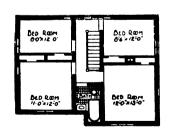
HOUSES SOLD UNDER PLAN NO. 3.
